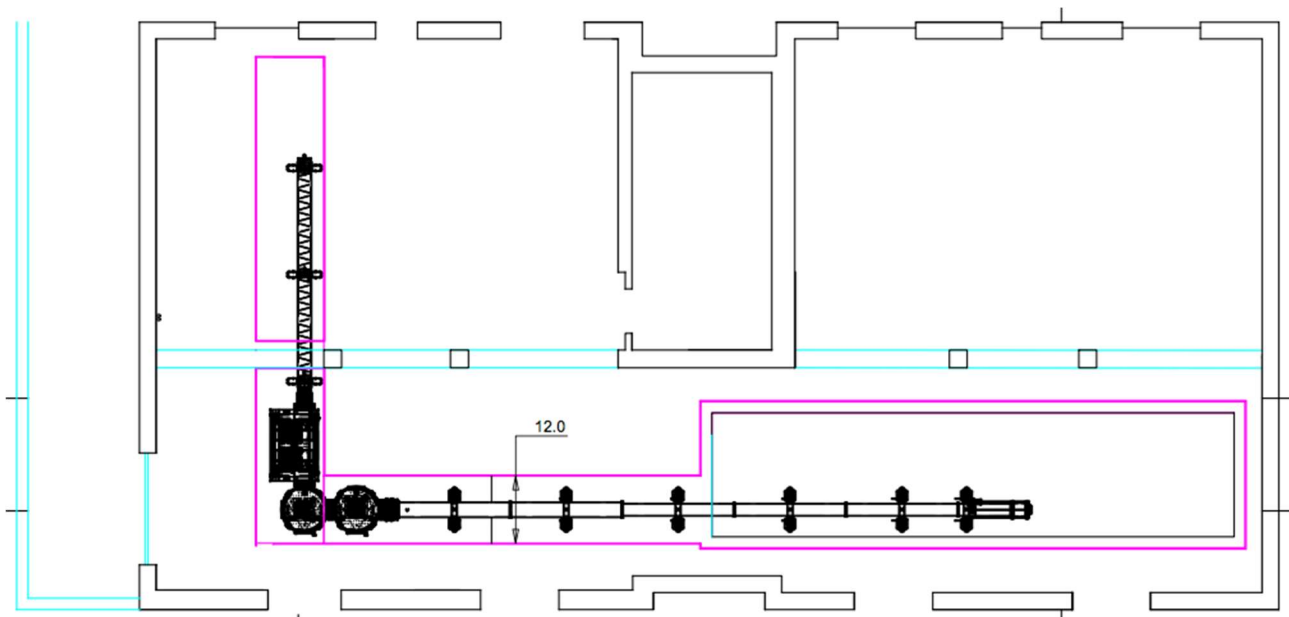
a schematic project of the laboratory, in the building basement (formerly, the building cellars). The purple line delimits the concrete floor onto which BEaTriX will be built. The vacuum system project (Sect. 3) has been superimposed.
